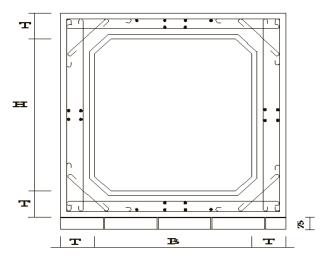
Typical Reinforced Cement Concrete Box Culvert Drain
